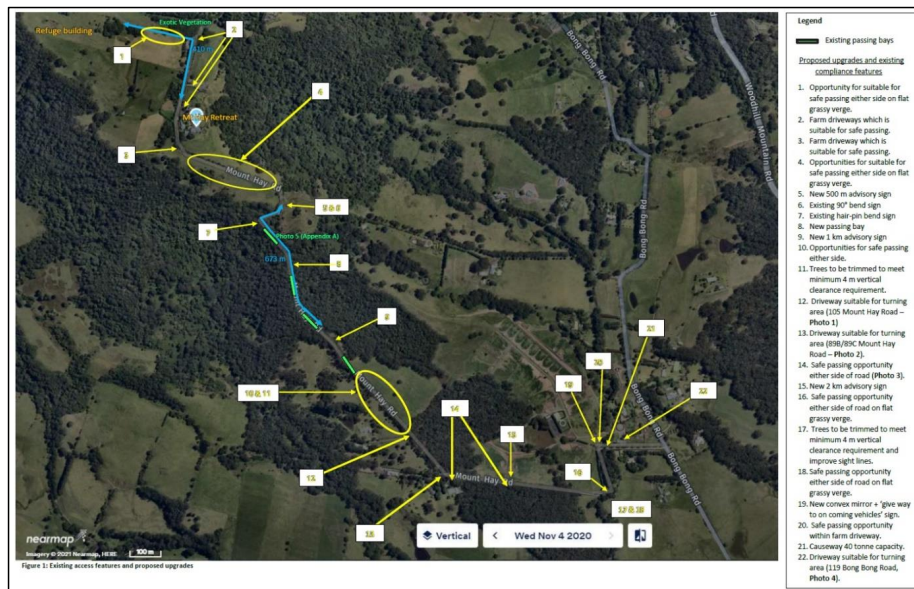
Existing access features and proposed upgrades to Mount Hay (private) Road
